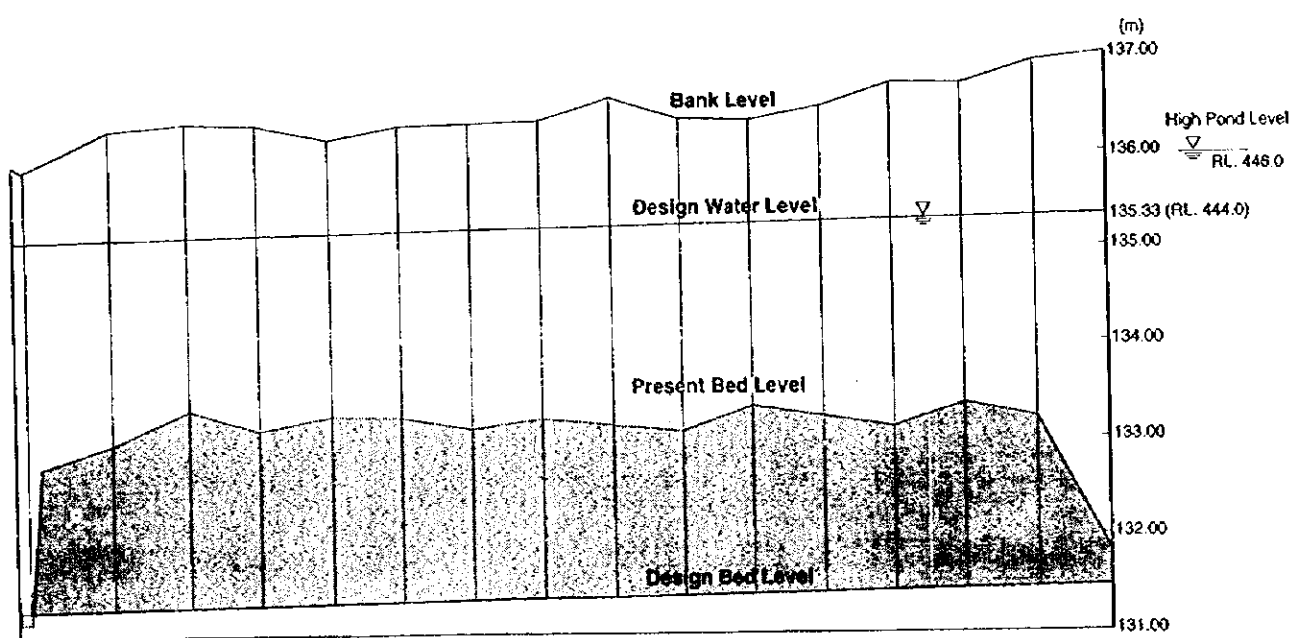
Cross Section of D.G. Khan Canal at Taunsa Barrage (4/4)
